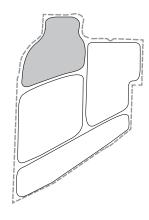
MURASE PLAZA AREA ENLARGEMENT
